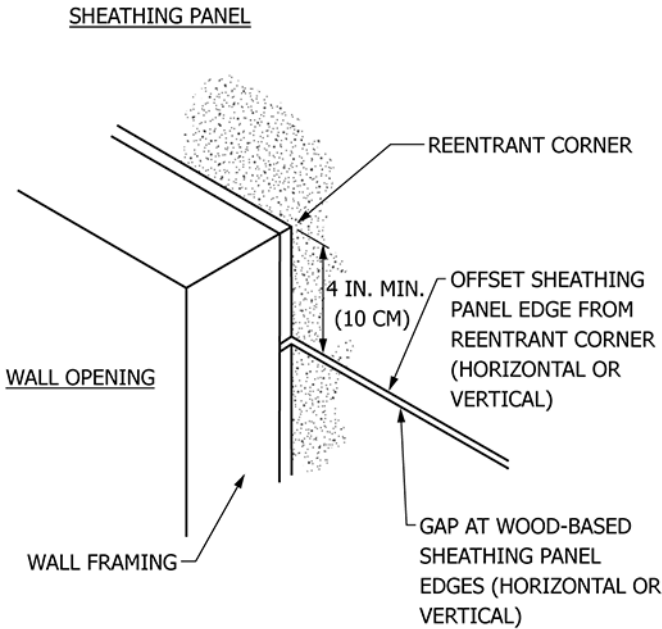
Wall Opening Reentrant Corner (Isometric View Looking Up at Wall Opening Corner)
